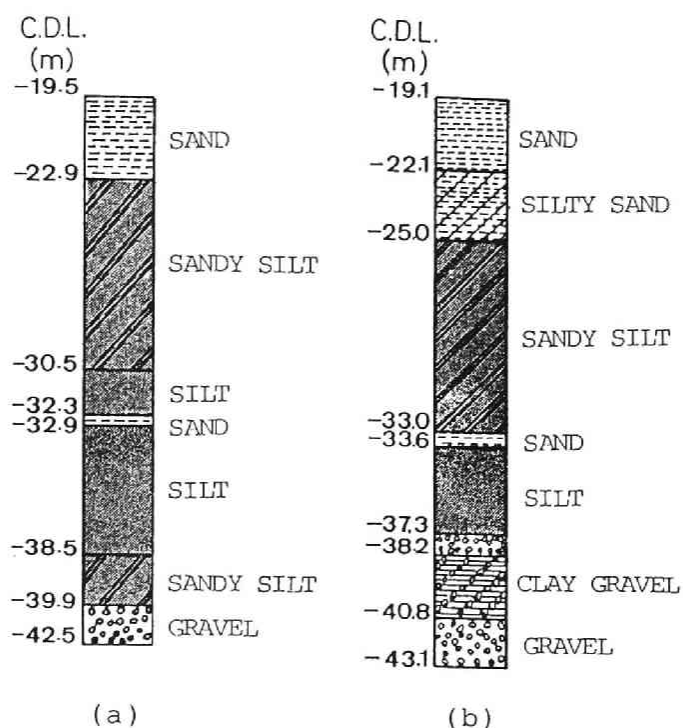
Soil Boring Logs; (a) Boring No.7 at Section B, (b) Boring No.9 at Section C
